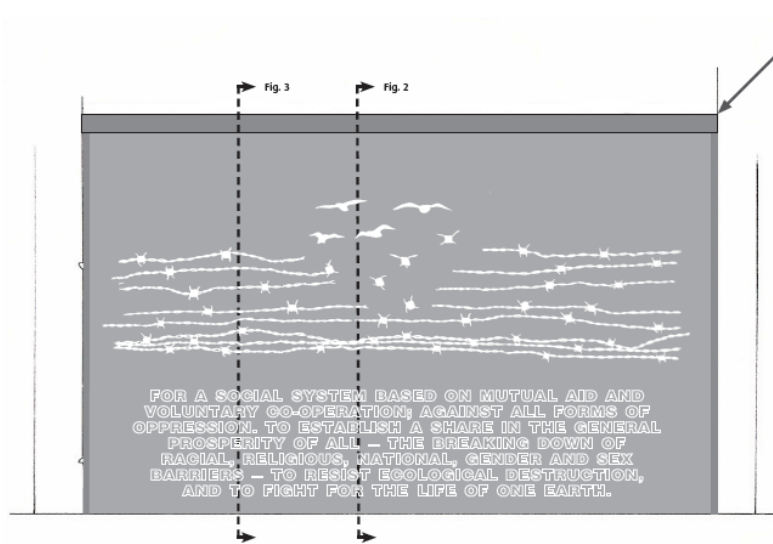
Front Elevation with Proposed Roller Shutter in the open position [1:50]
